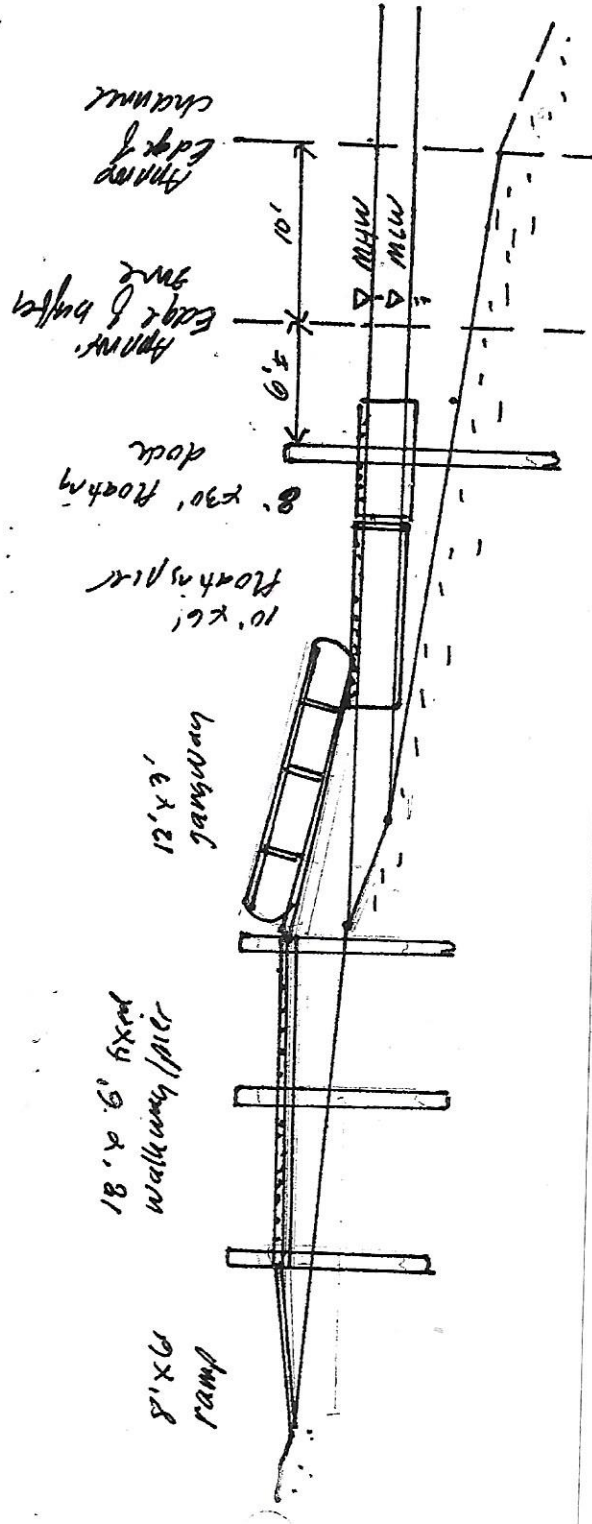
Plan view of proposed project (prepared by Precision Marine Construction, Inc.).
